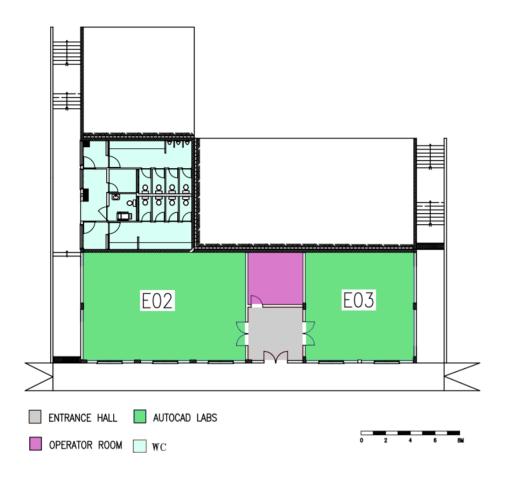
E3 Block Ground Floor Plan currently in use
